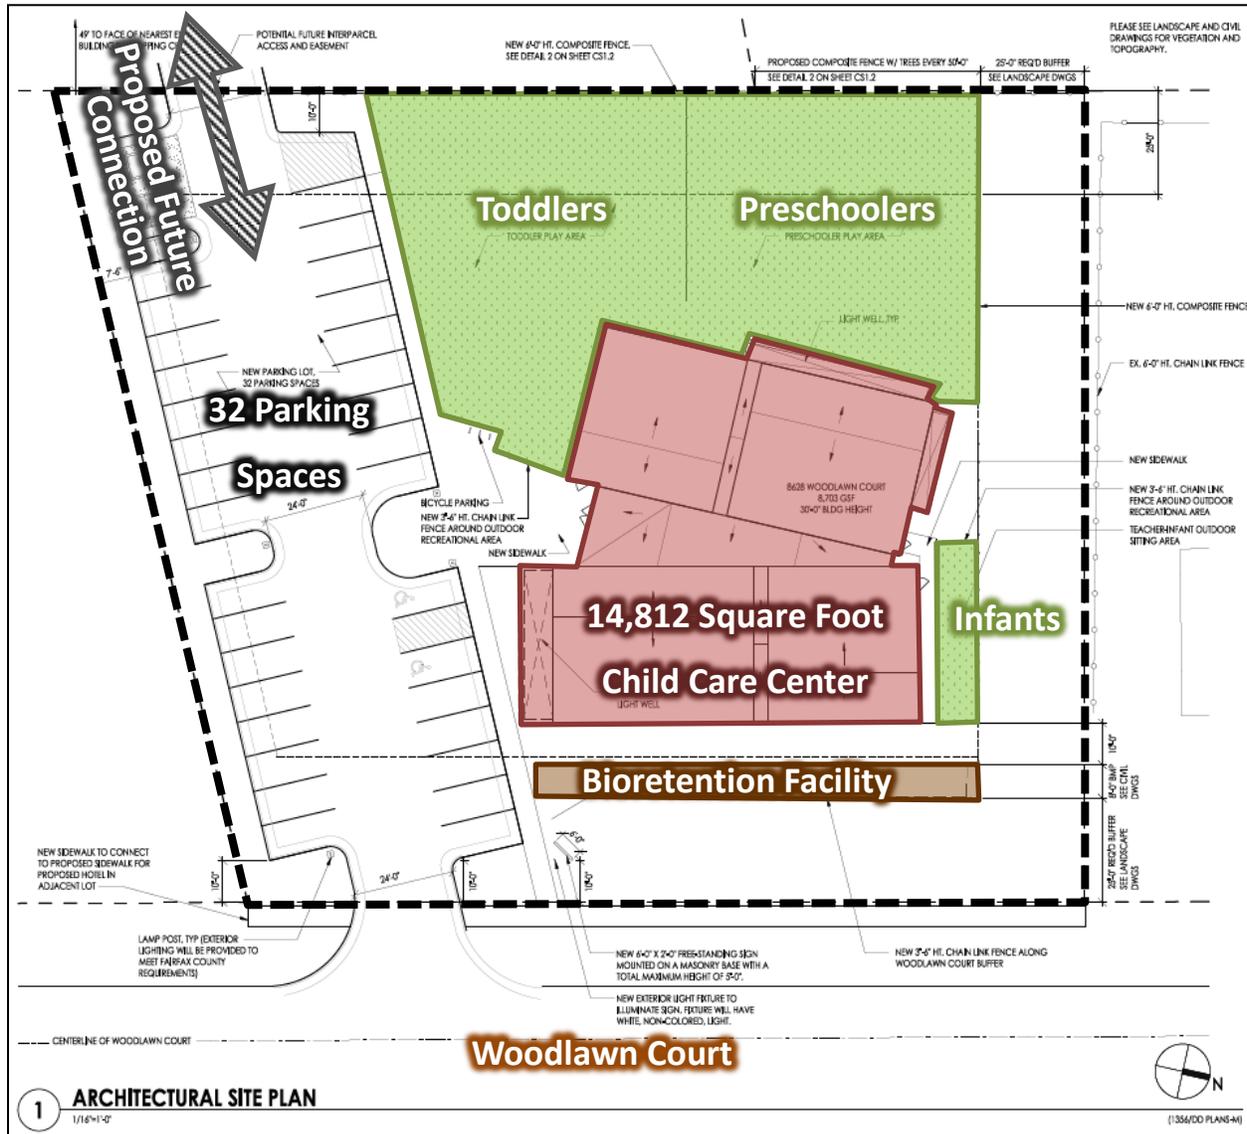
The proposed site layout (Source: McAllister Architects, P.C., 6/5/2015)
